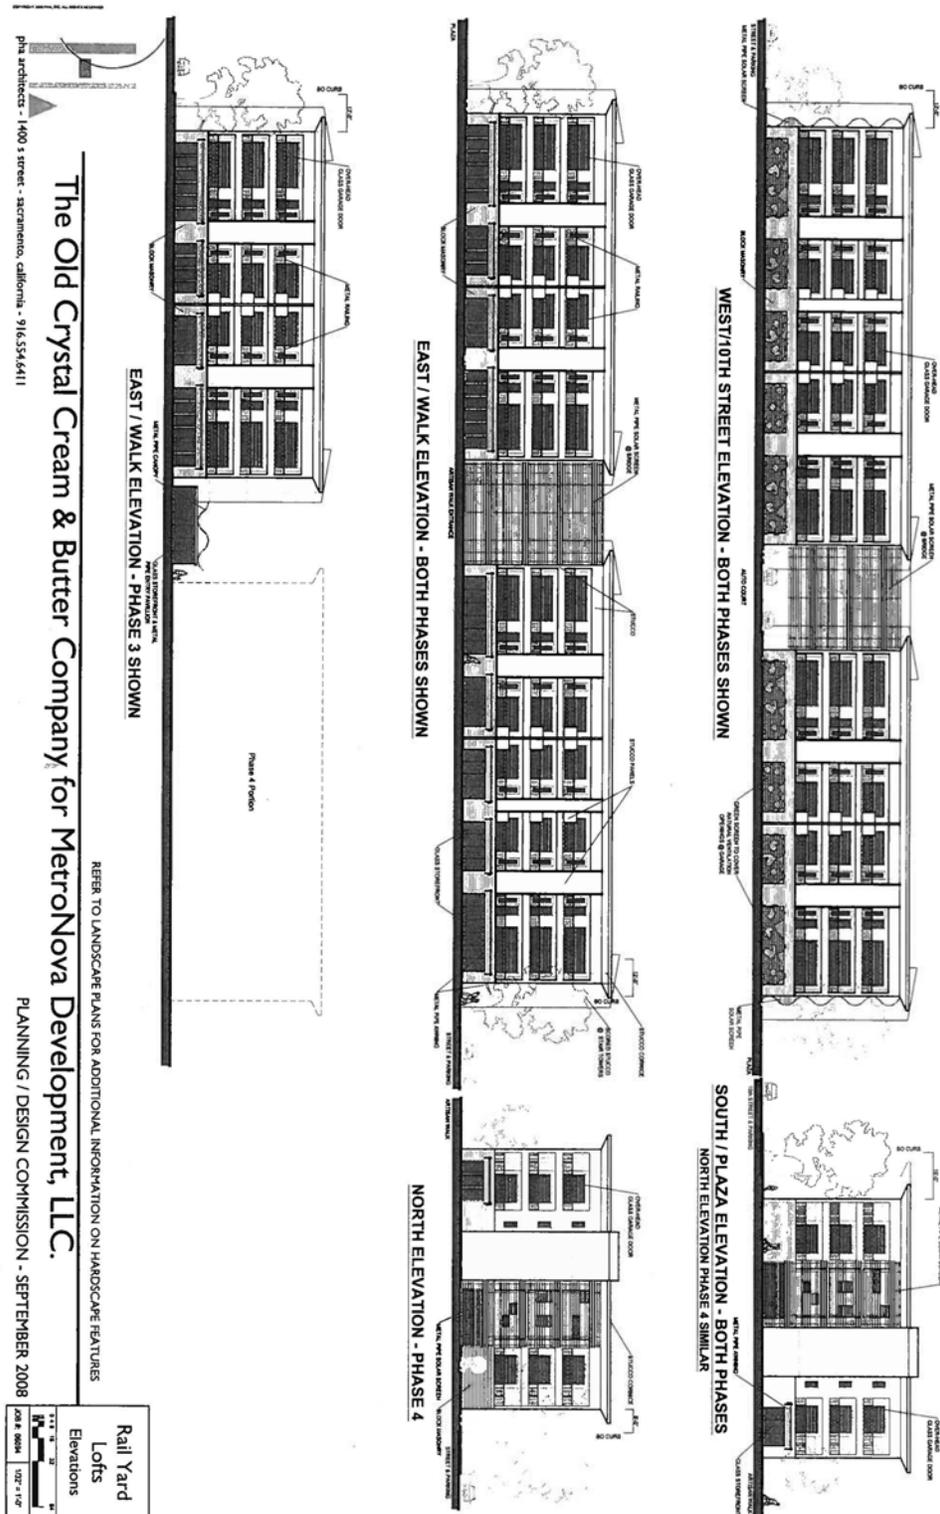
Exhibit X: North Block: Rail Yard Loft Phasing Plan
